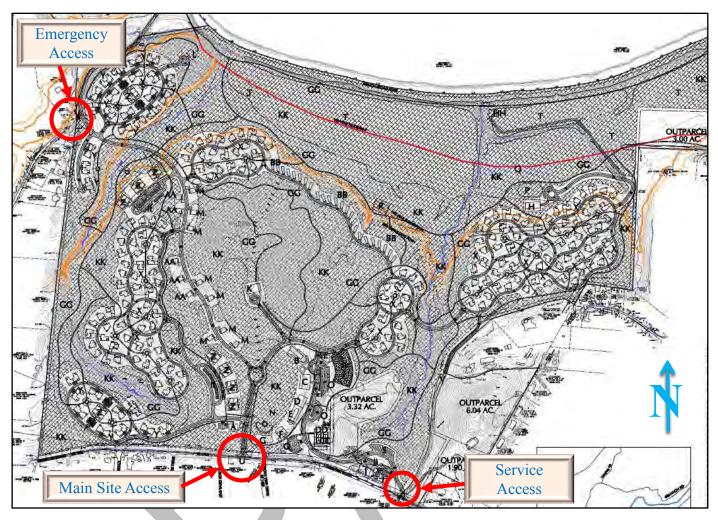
Site Pan - (Site Plan Provided by Land Planning Collaborative)
